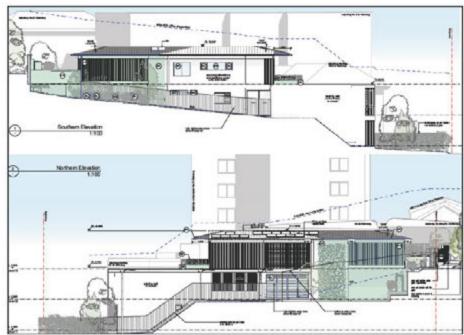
Side elevation plans depicting the proposed built form and ground level at the side boundaries of the site.
